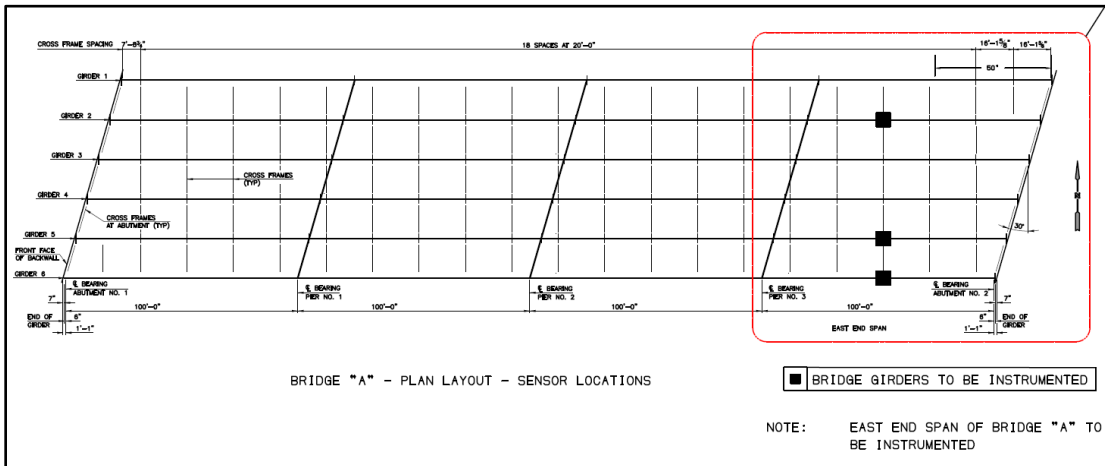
Bridge “A” Plan Layout identified with Girders to be Instrumented
